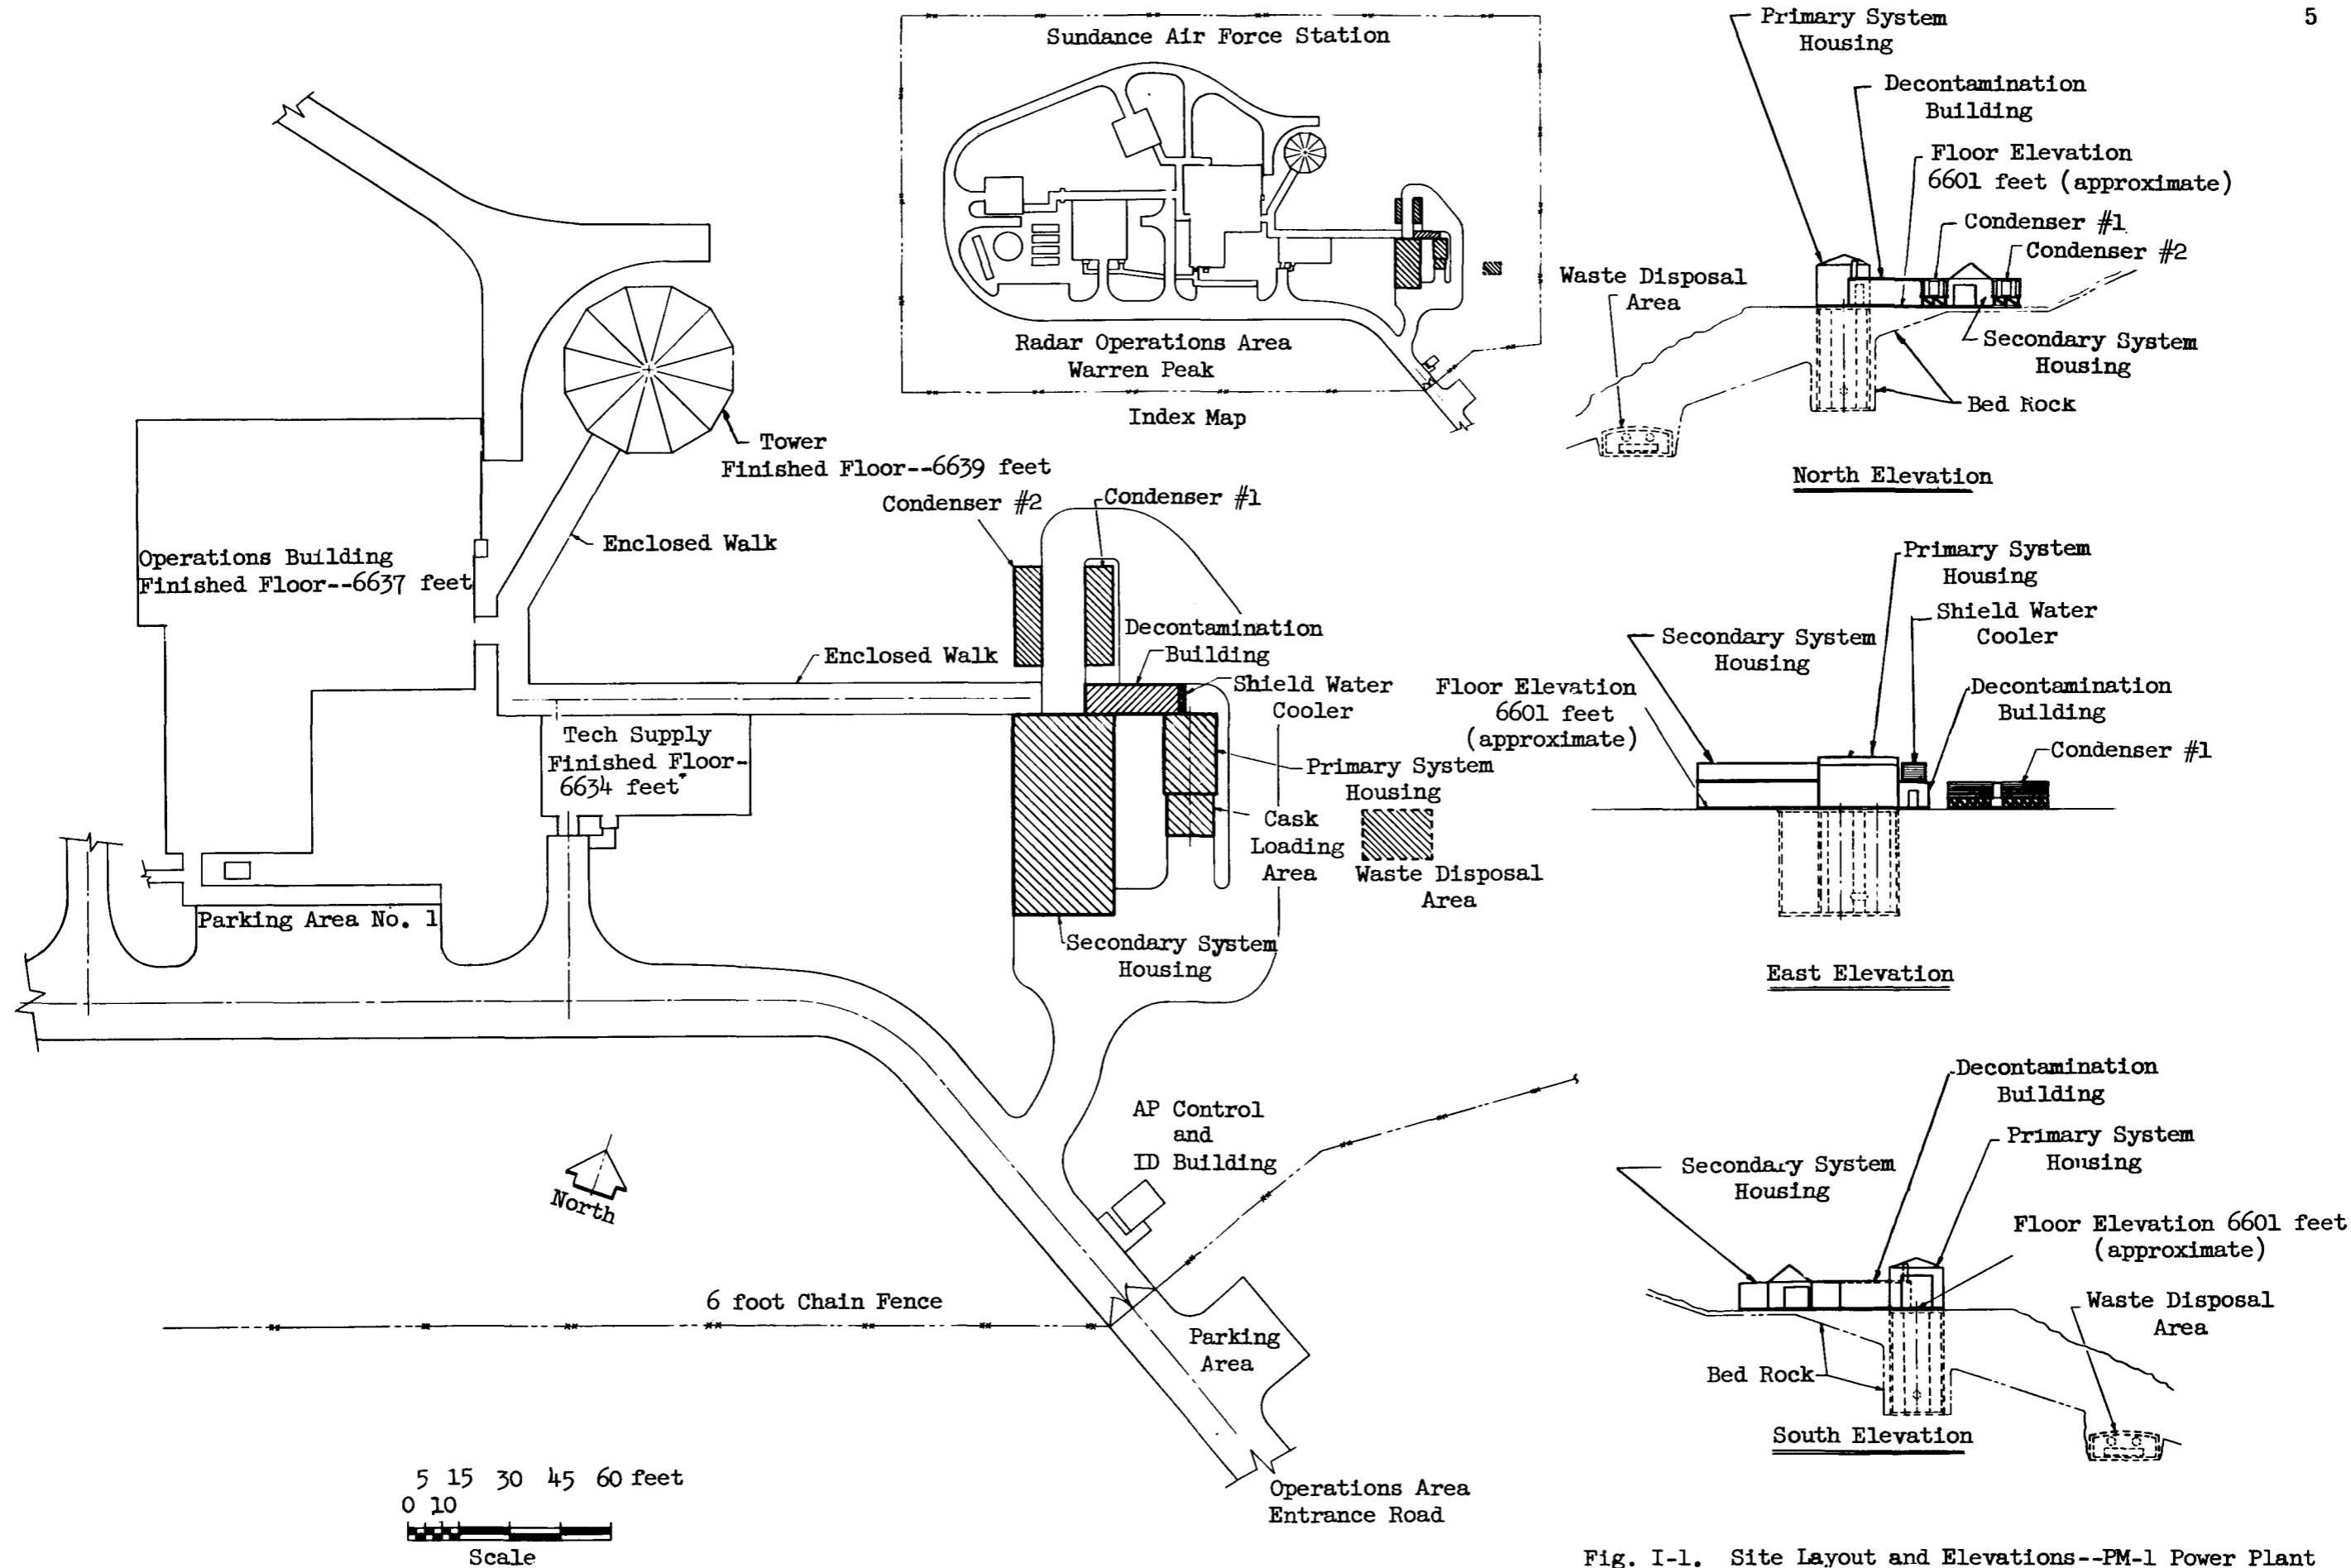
Site Layout and Elevations--PM-1 Power Plant
